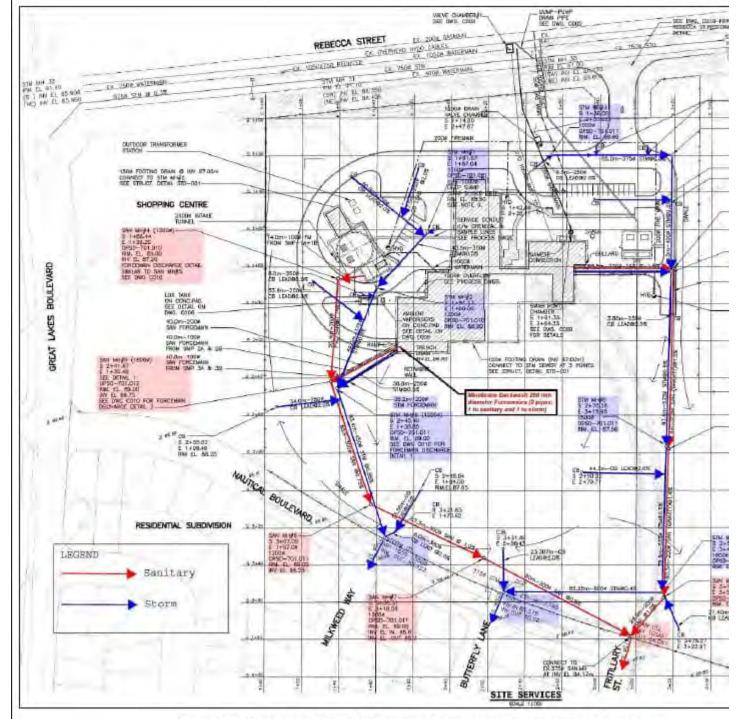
Burloak WPP Site Layout Showing Existing Site Services
